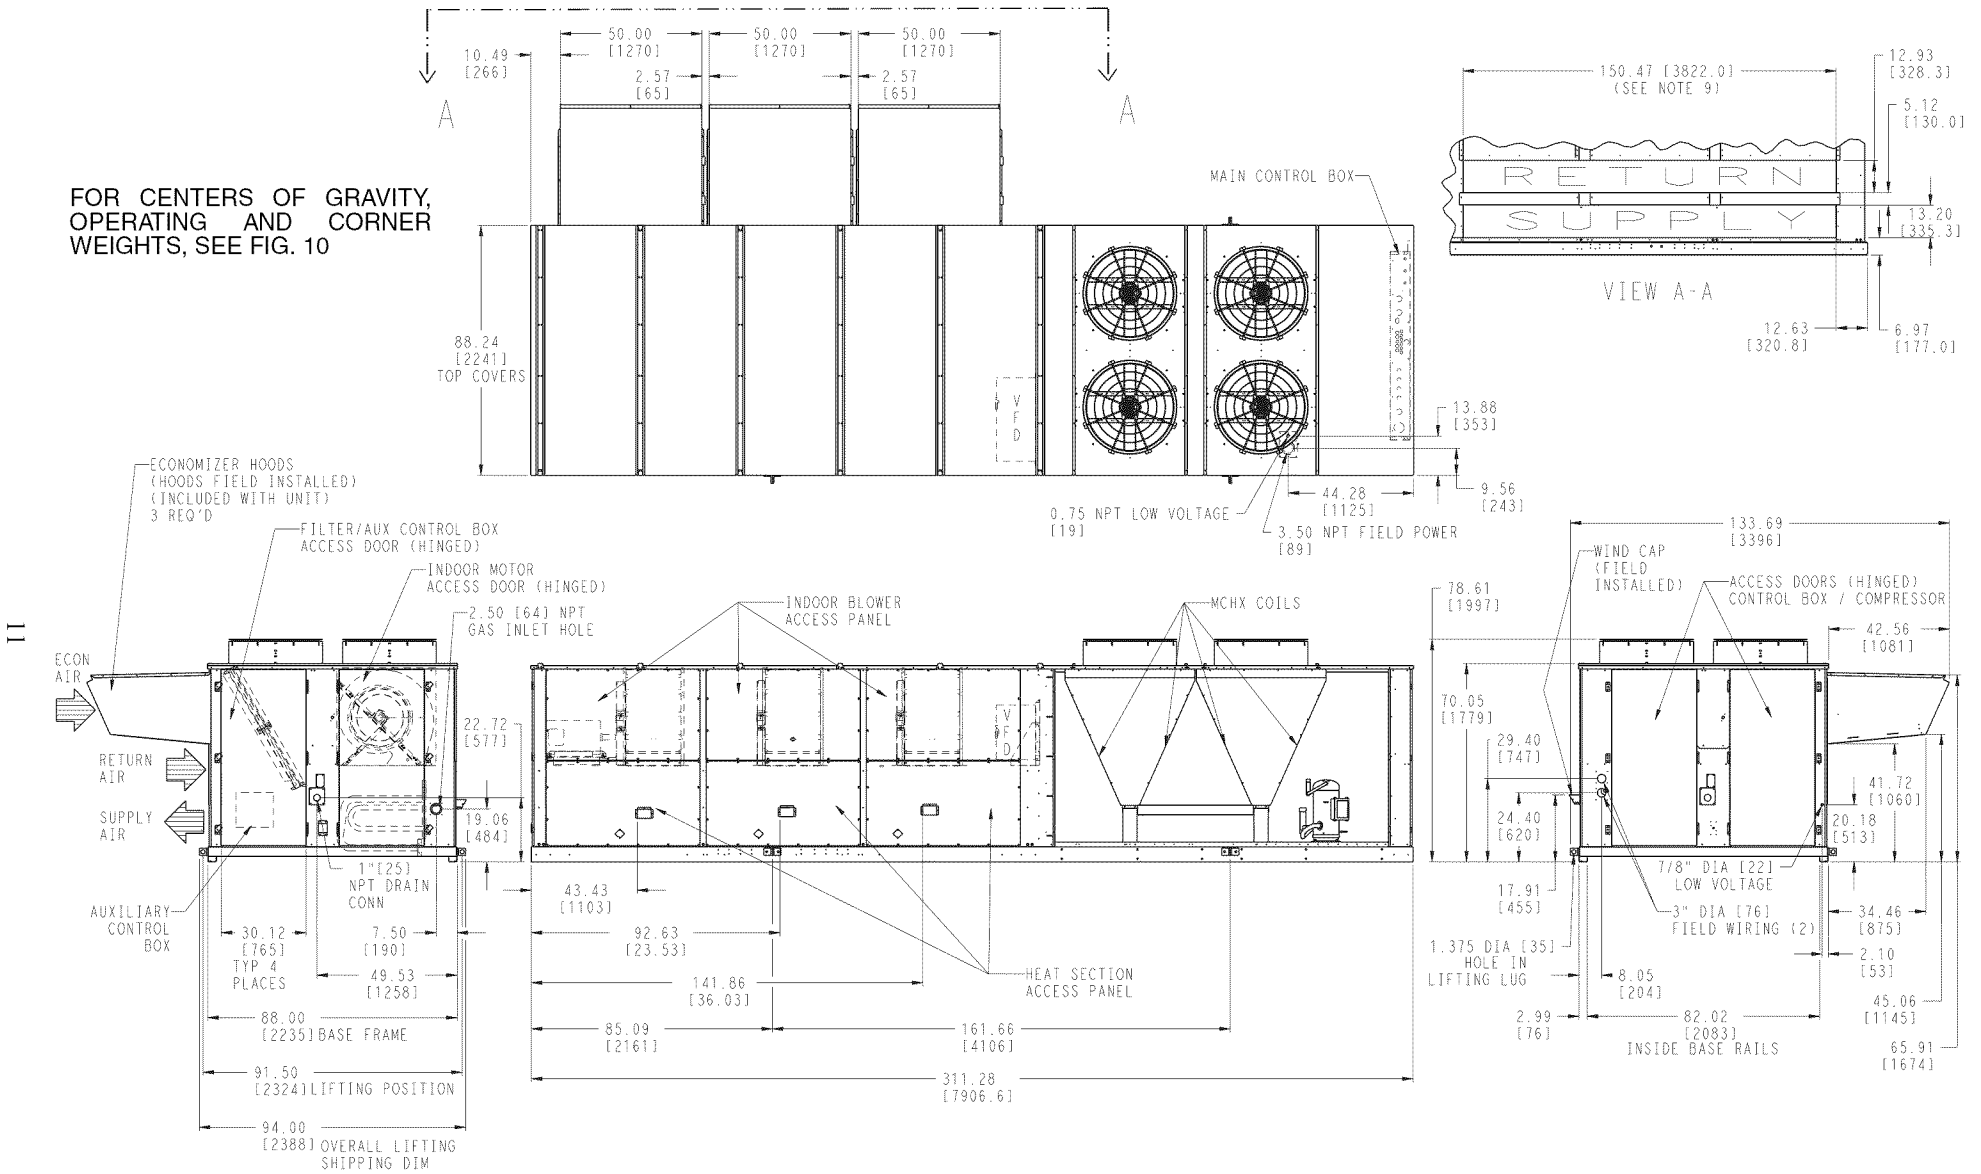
Base Unit Dimensions — 48A4,A5060
